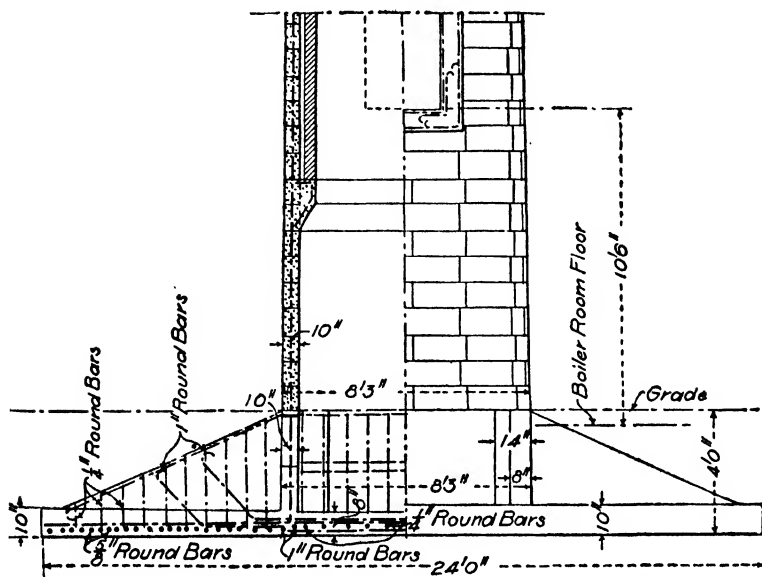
Slab and Box Footing of Reinforced Concrete for a 125-ft. Chimney in Chicago.
